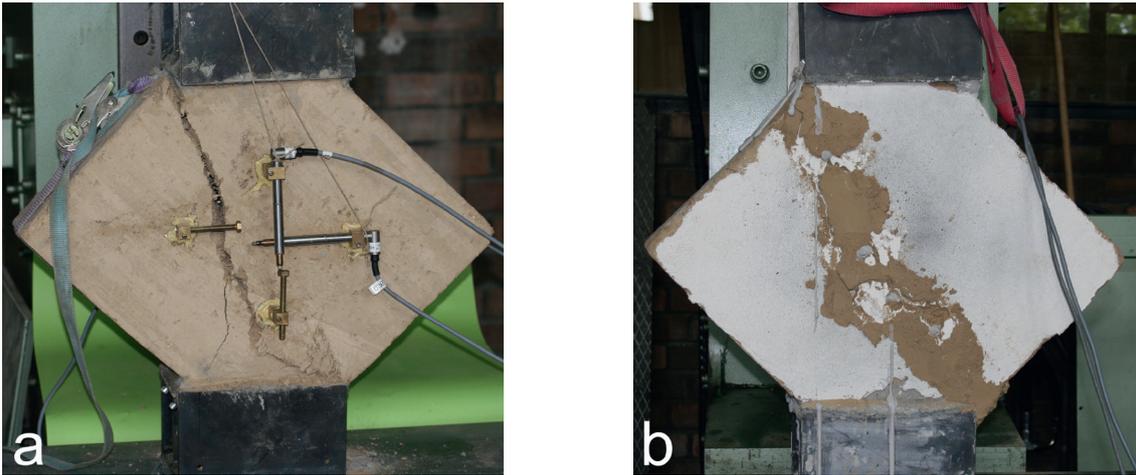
Cob wall panel after diagonal compression test (a) and after grouting (b)
